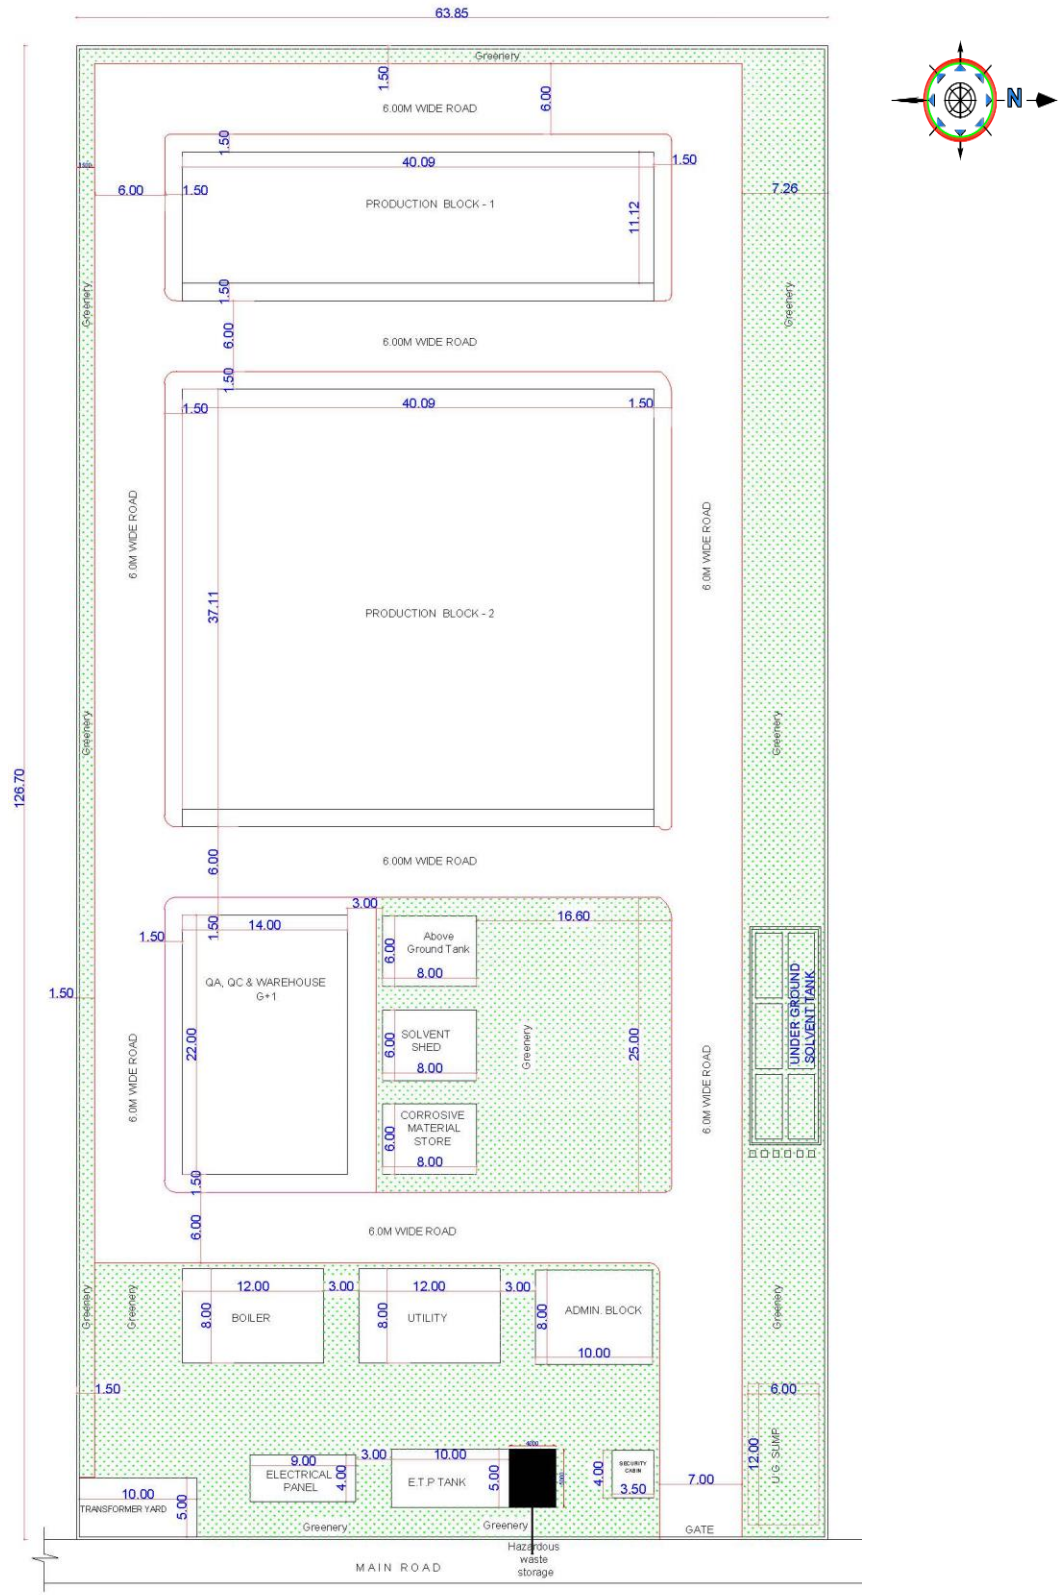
LAYOUT PLAN OF THE PROJECT SITE
